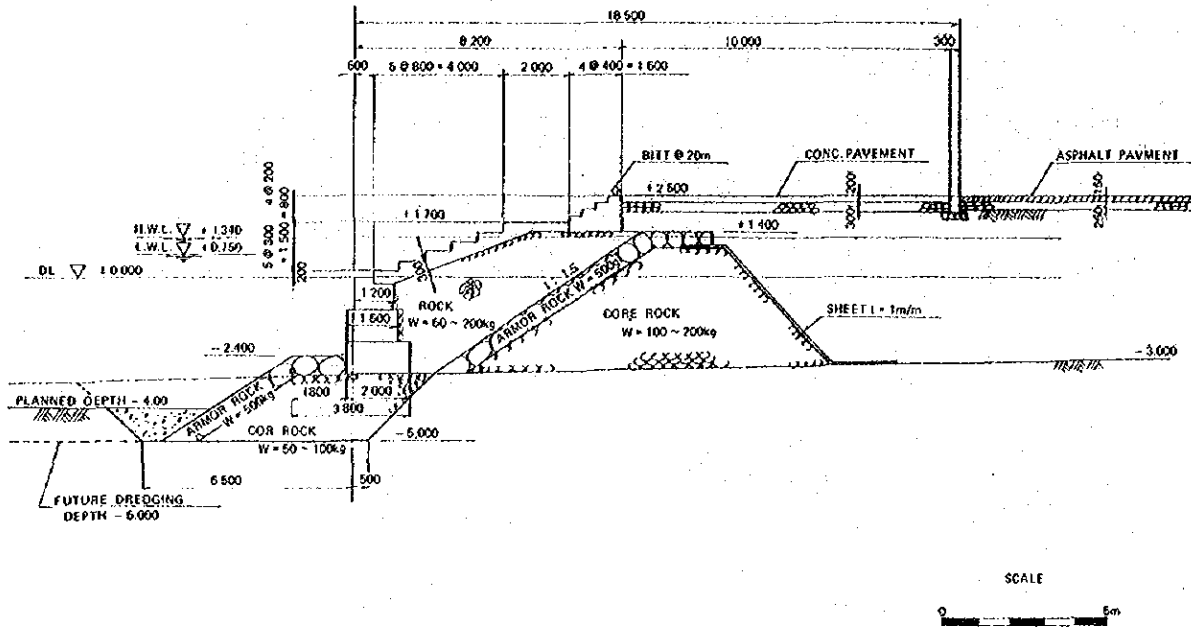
Cross Section of Stair Landing -- Iloilo Port
